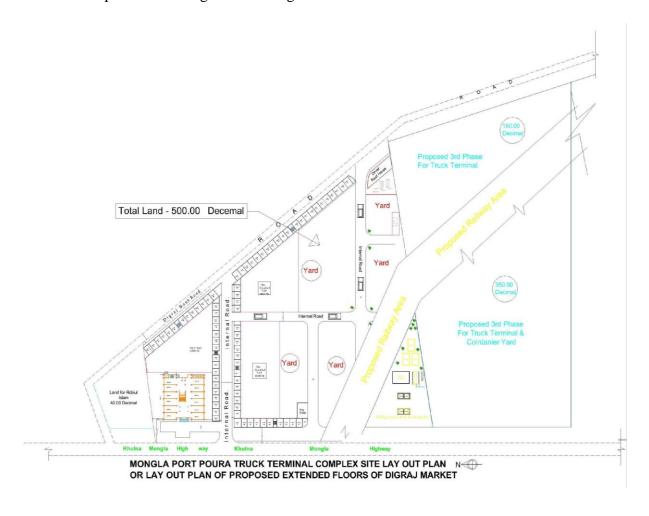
Layout plan of proposed floor of Improvement of Truck Terminal cum Boundary Market & Multipurpose Building (CIP-20)
